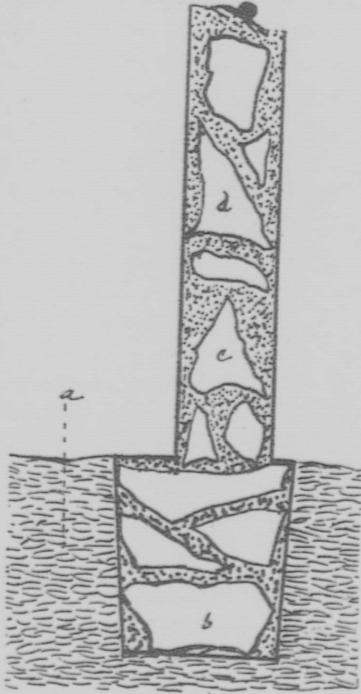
End section of a bad foundation and a poorly constructed concrete wall. Note the foundation resting on the soil A, instead of the soil on the foundation, as in Fig. 1, the wall placed on one side of the foundation, and the wedge-shaped stones C and D, tending to split the wall.
